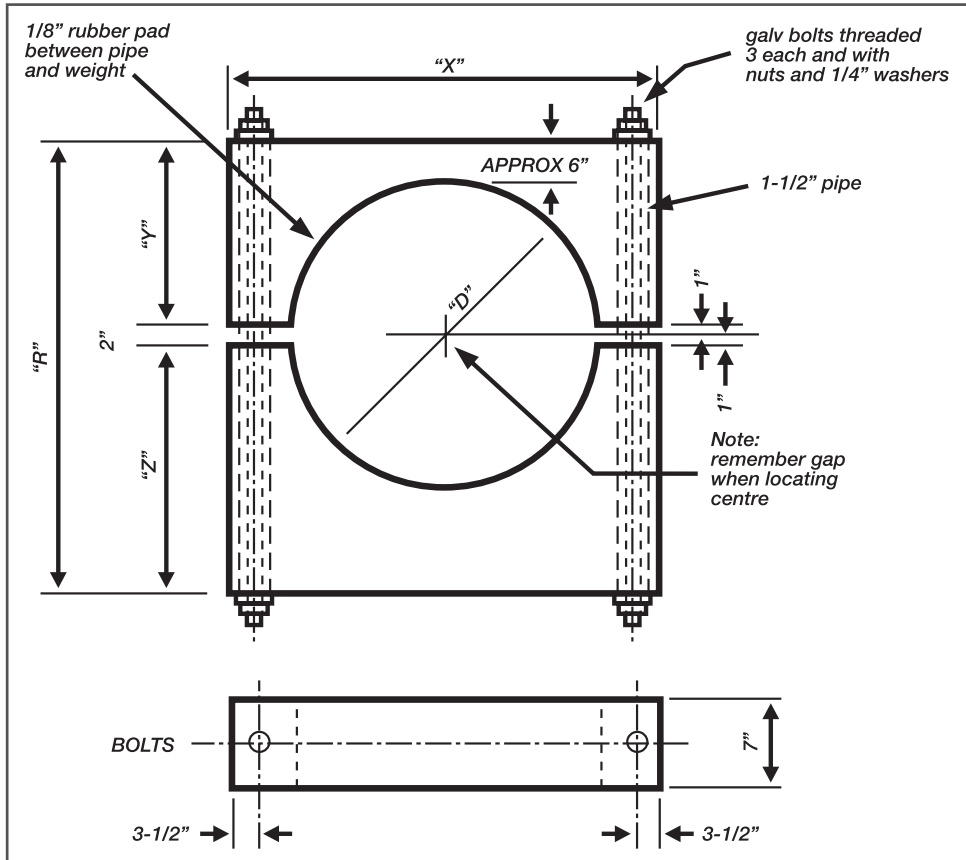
Typical Detail of Concrete Ballast Showing 1-inch Gap Between Ballast Sections
